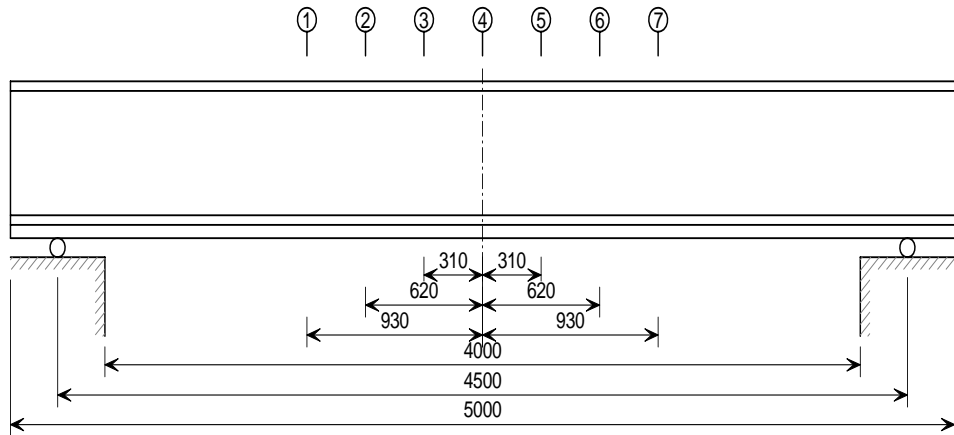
Longitudinal arrangement – Position of thermocouple cross sections
